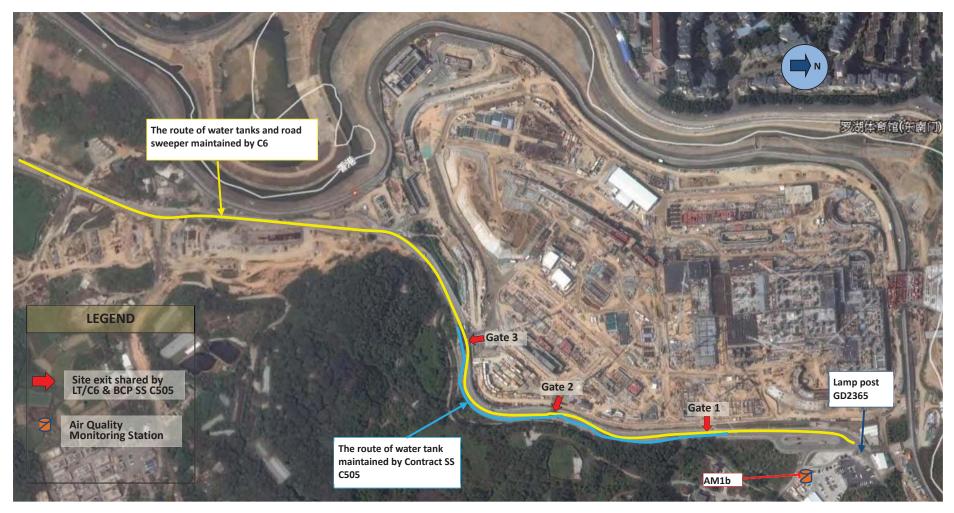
Location Plan for Site exits along Lin Ma Hang Road
